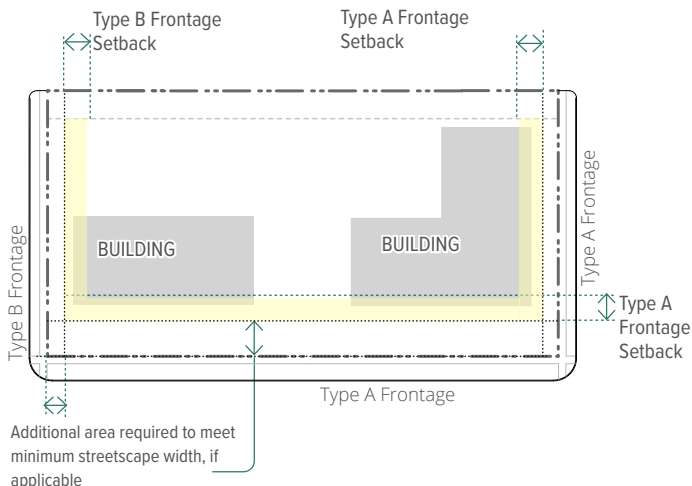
Minimum Type A Frontage Streetwall Build-to-Zone Coverage
